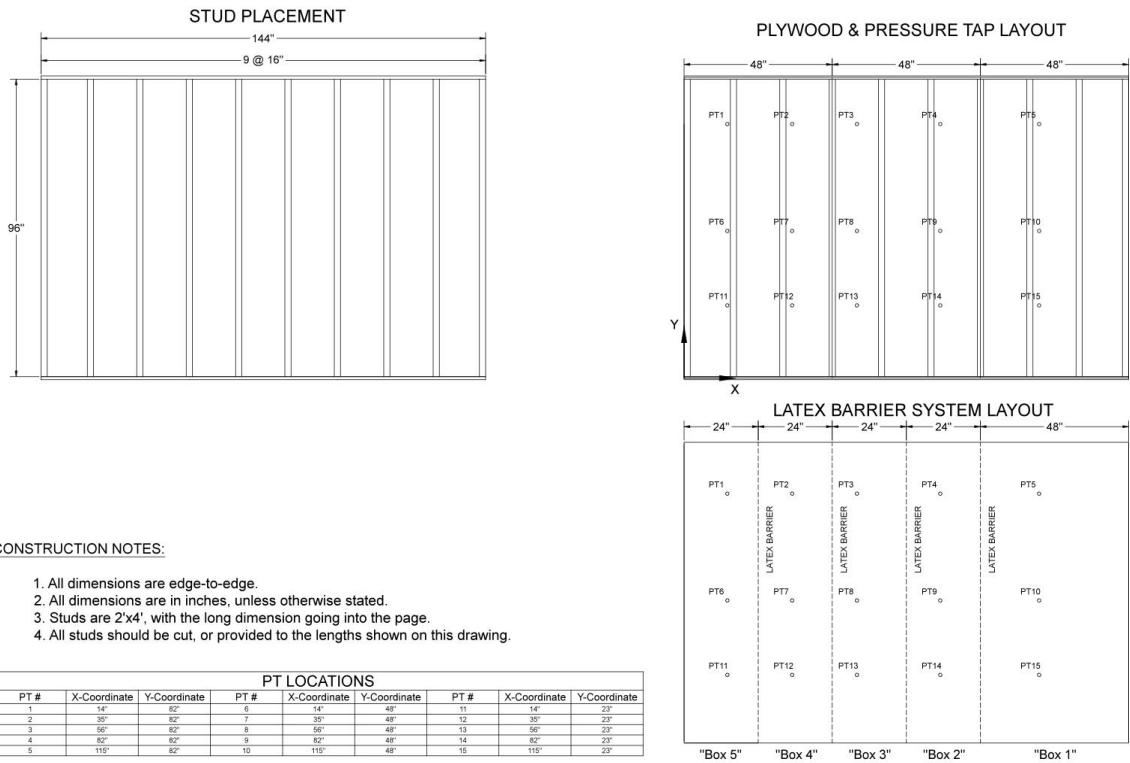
Technical drawing of a sample test specimen, showing the location of the studs, latex barriers, and pressure taps.
